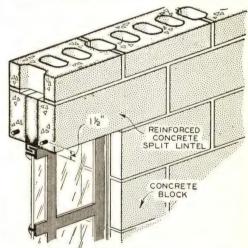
Reinforced Concrete Split Lintel in Concrete Block Wall
